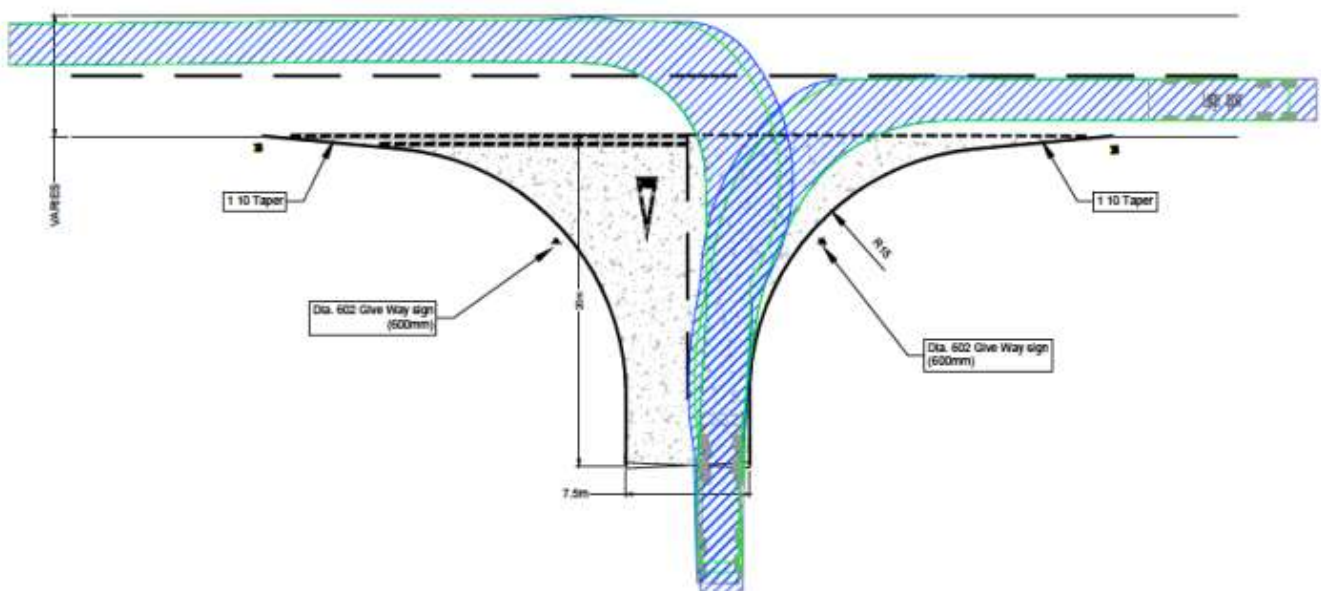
Outline Design 'Type A' Accesses, Outline Construction Management Plan, Annex B
